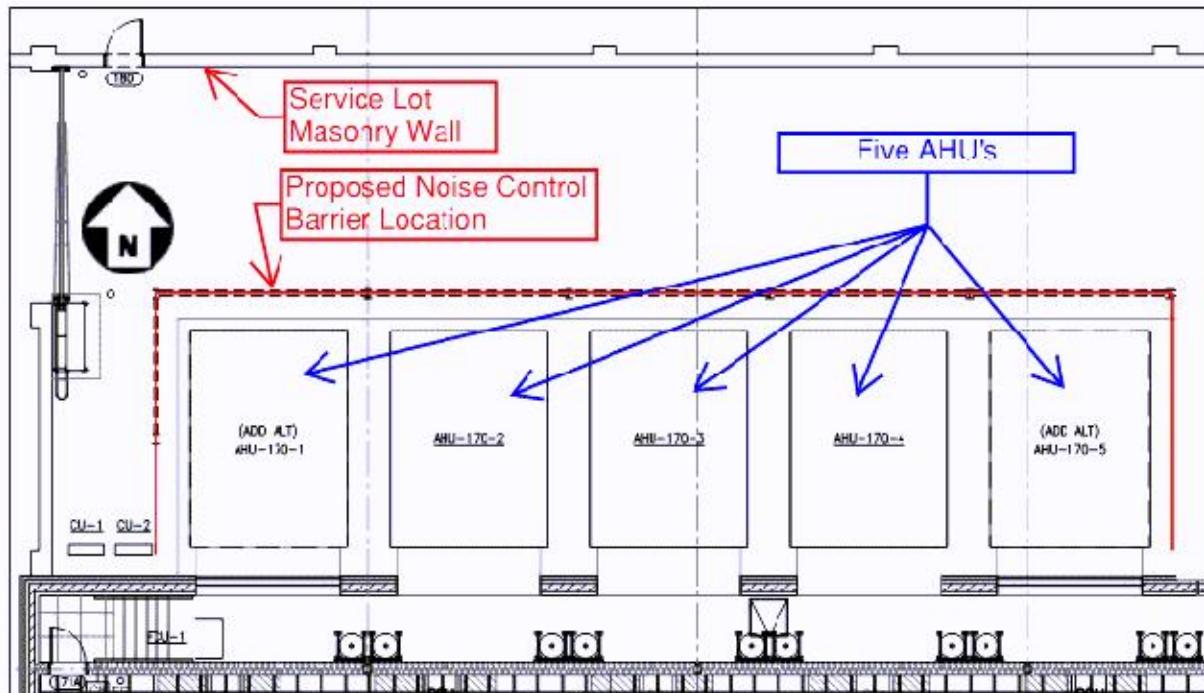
Partial plan view showing the layout and location of the proposed barrier wall.
